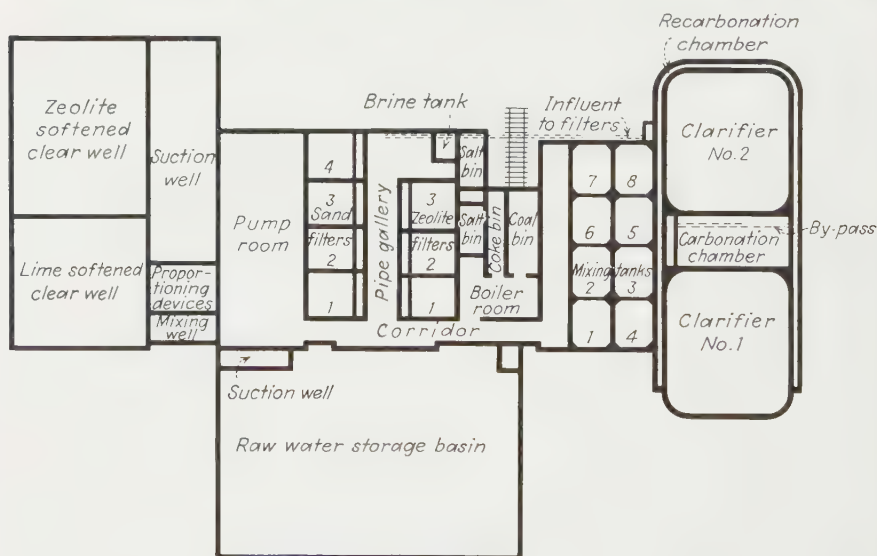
Plan of 4-mgd water-softening plant at Findlay, Ohio.
